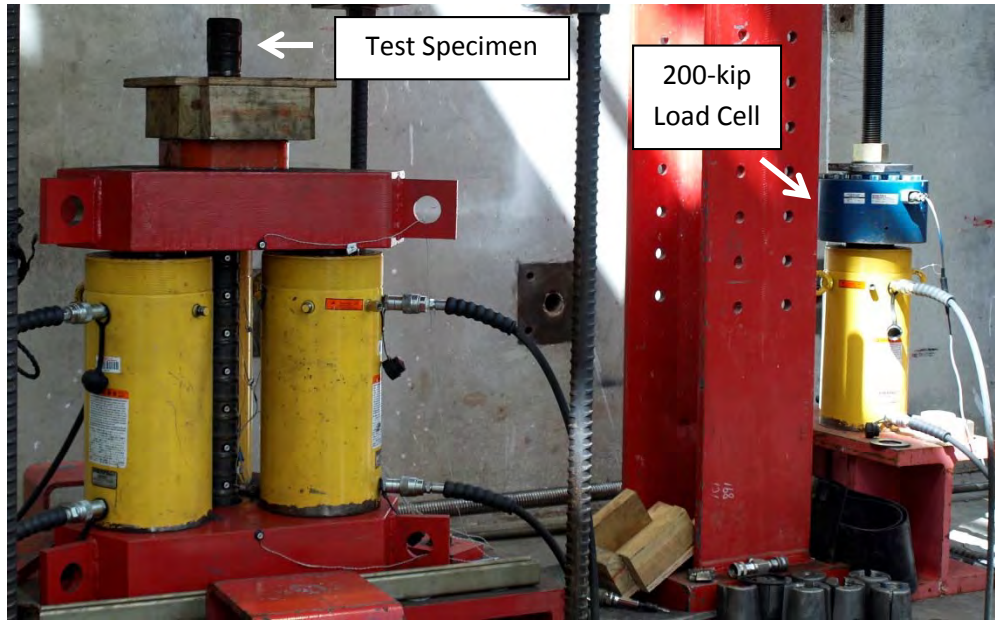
Custom testing rig used to test No. 11, 14, and 18 bars (No. 18 bar shown)
